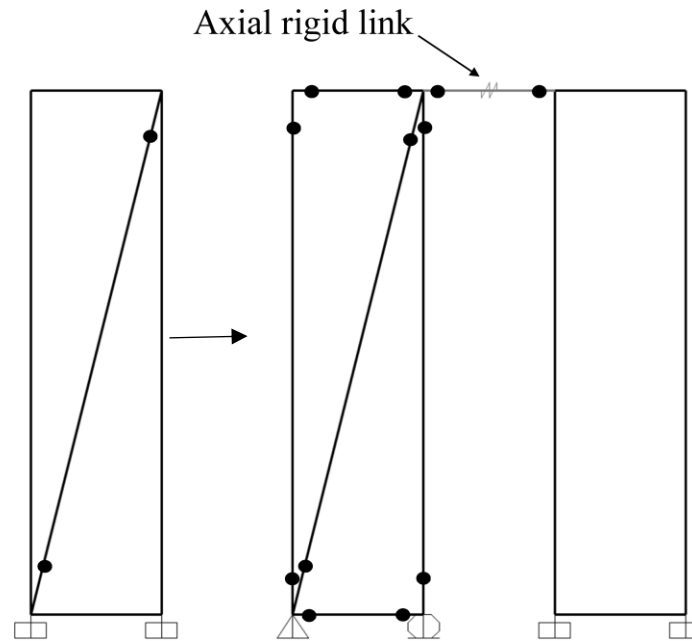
Truss and frame action decomposition of a narrow strap-braced wall
